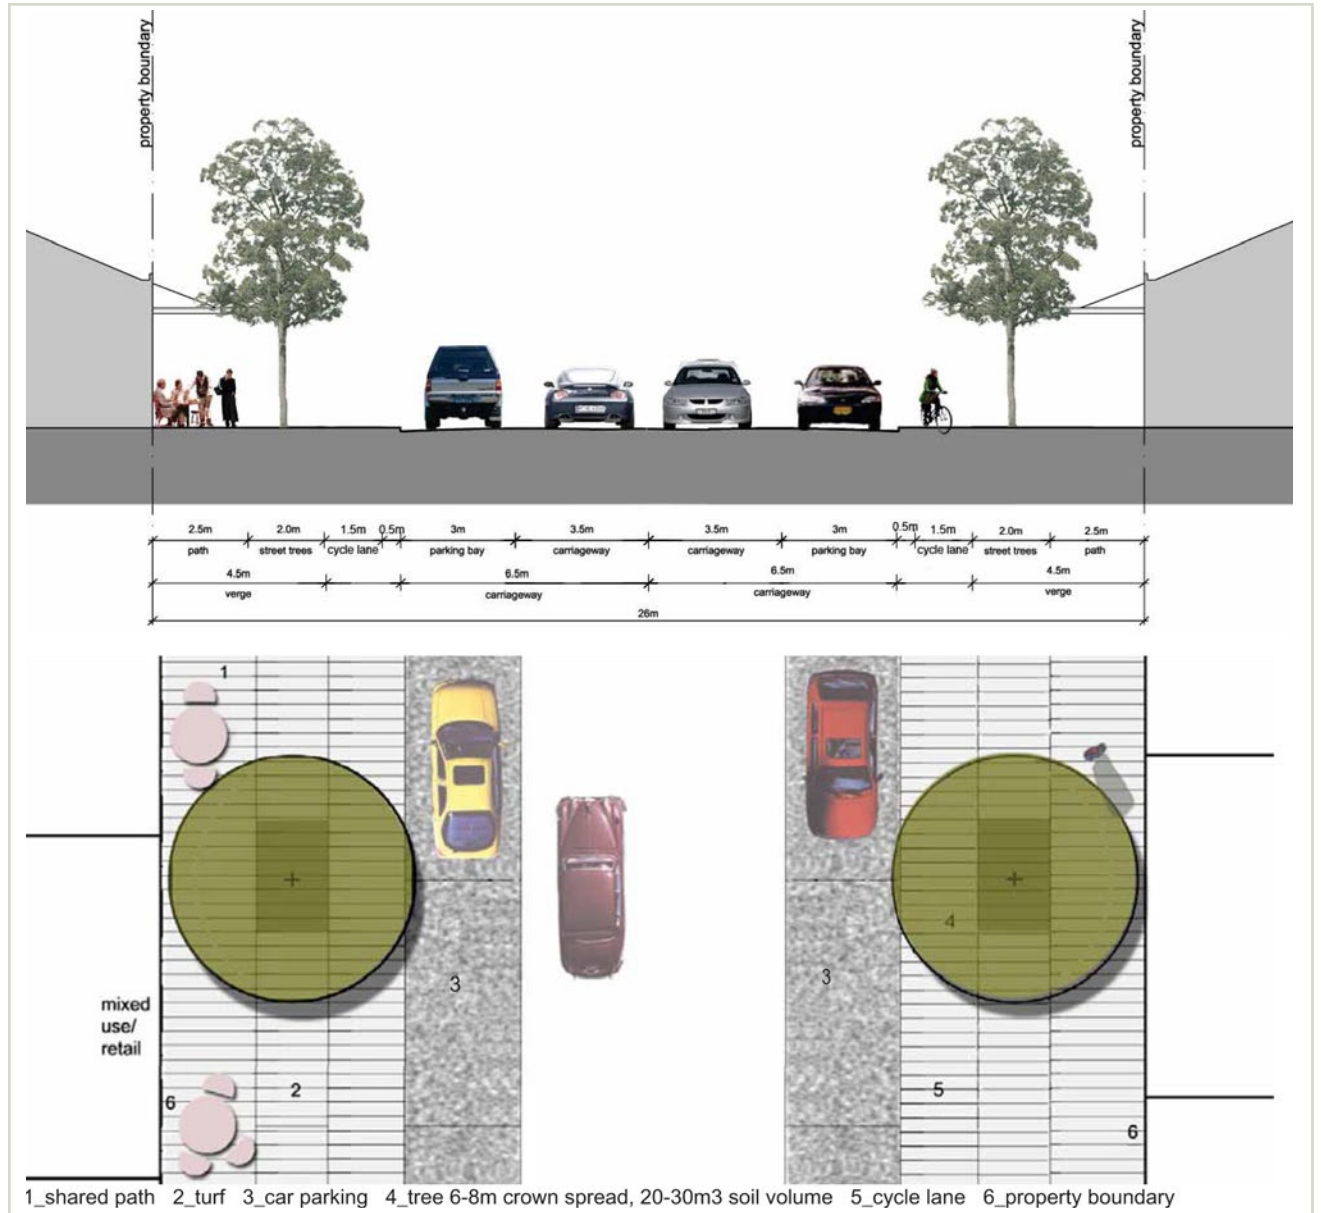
Minmi Boulevard Within Proposed Village - 26m (Section 2-2)
